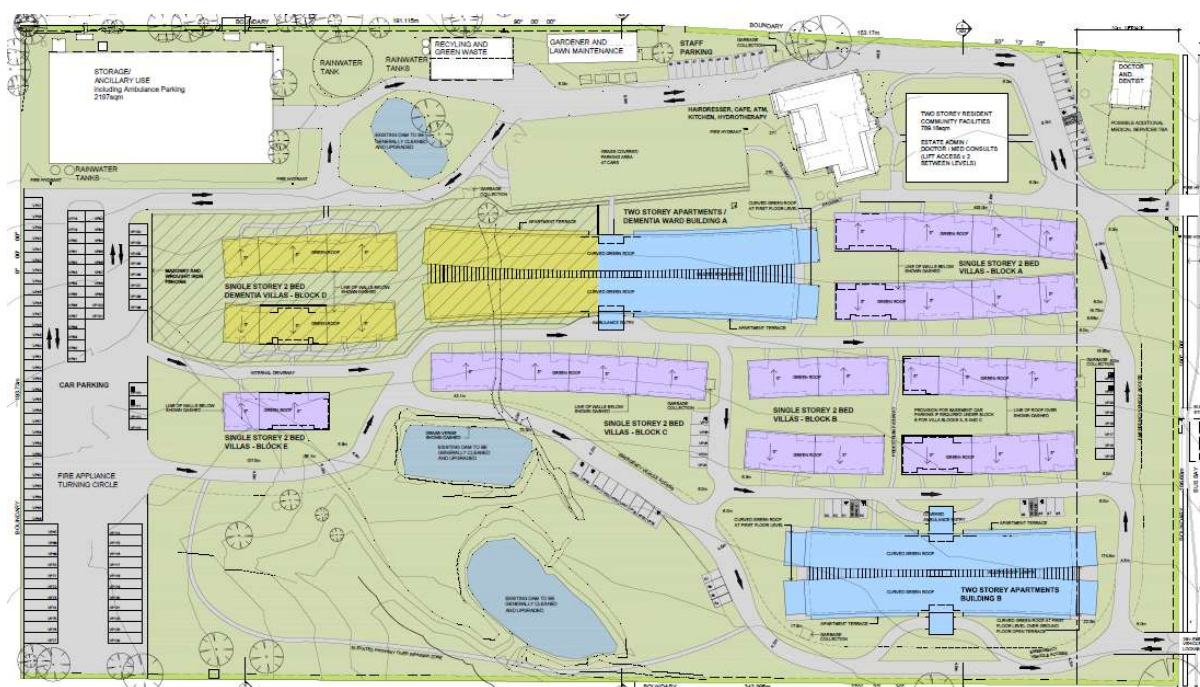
Indicative building plan (source: Phil O'Donnell Architects).
